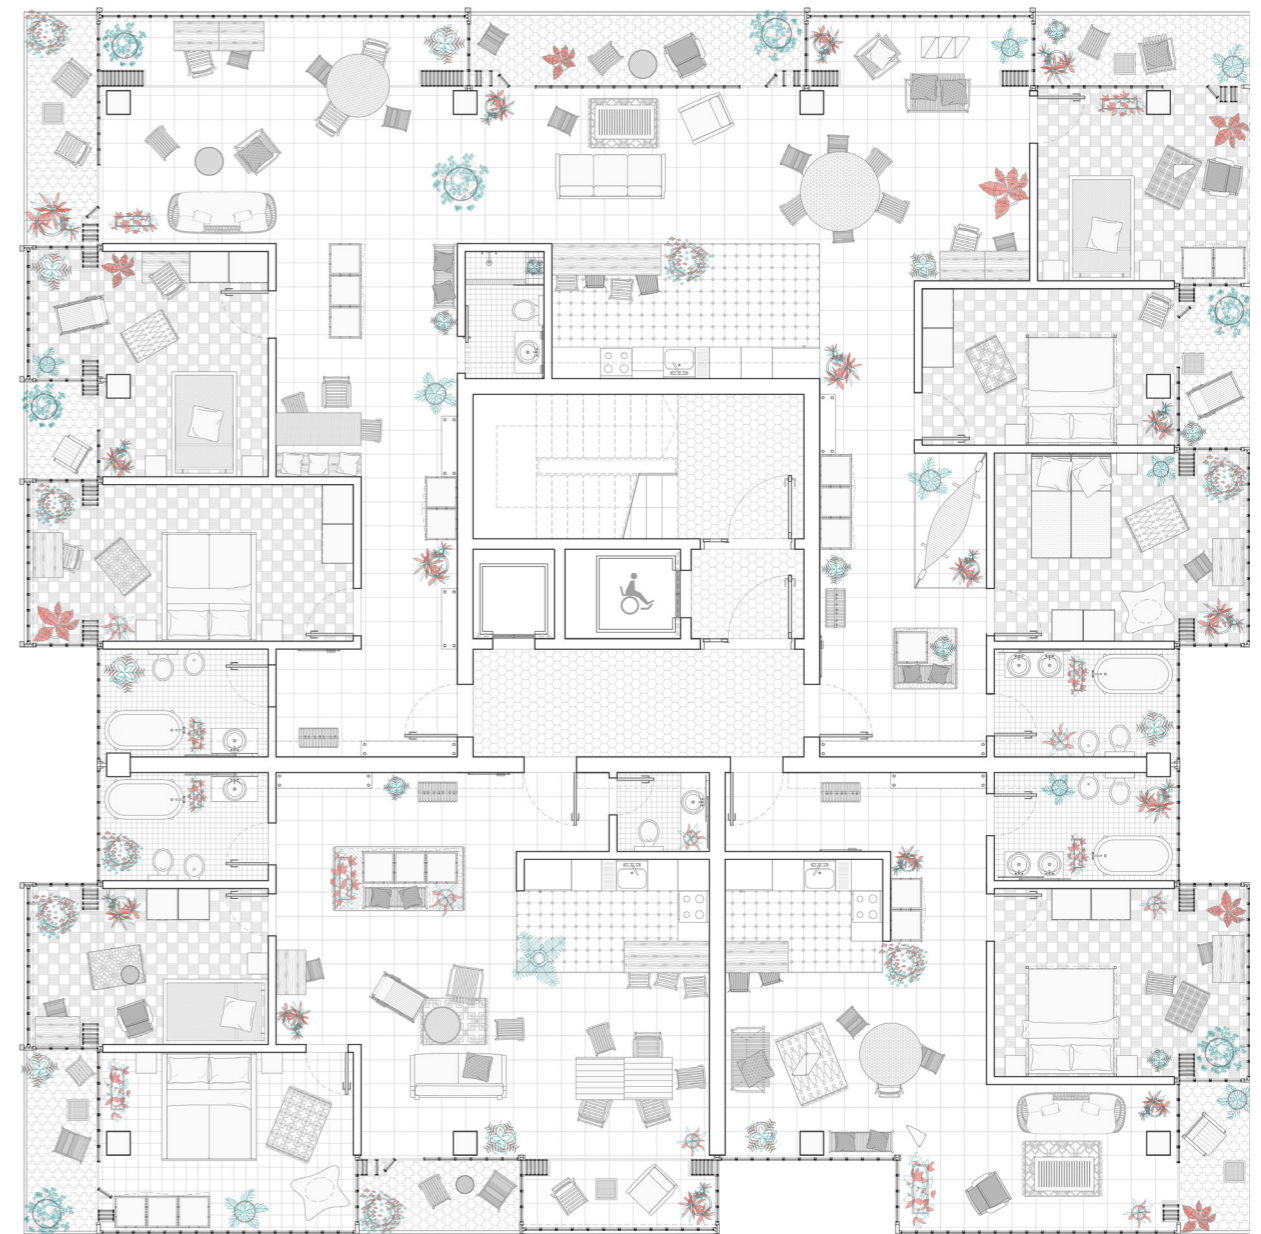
Type 3 - Dwelling Units Floor Plan, variation 1 (levels 12-13)
